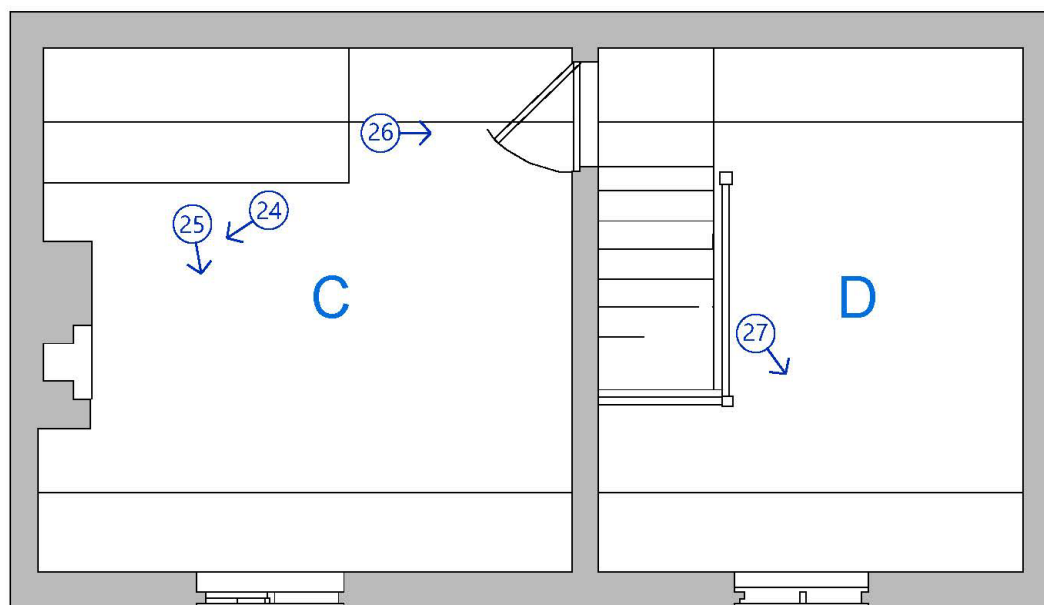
Plan of the first floor of Ford Cottage, with photo directions
